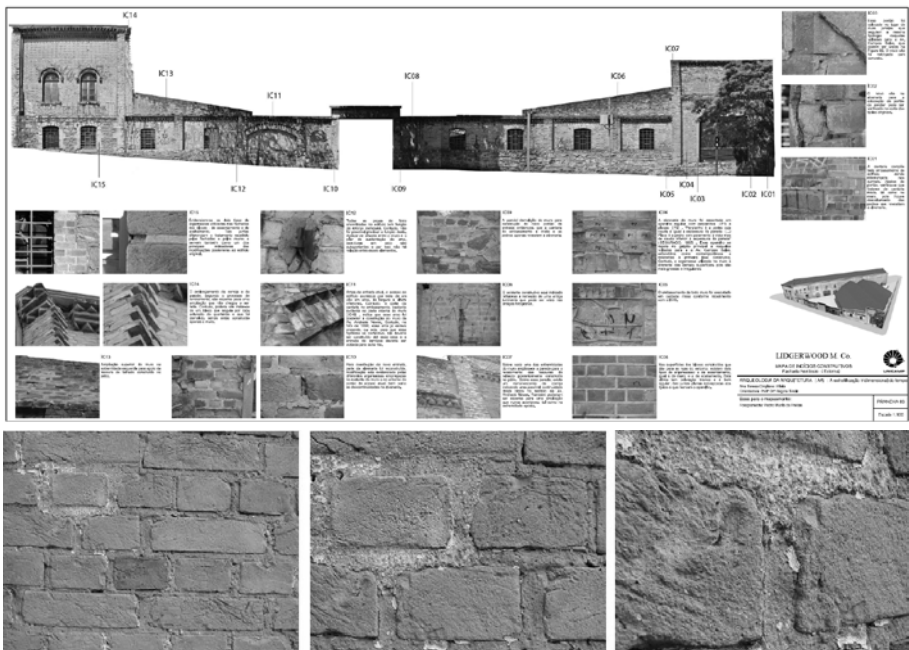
The Northeast Façade of the Lidgerwood M.Co. building and its material evidences (G-COR Architecture)
